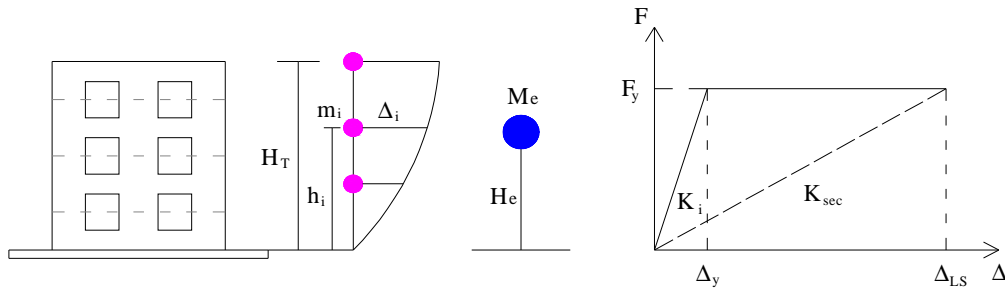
Nonlinear Static SDOF Idealization of Stone Masonry Buildings
